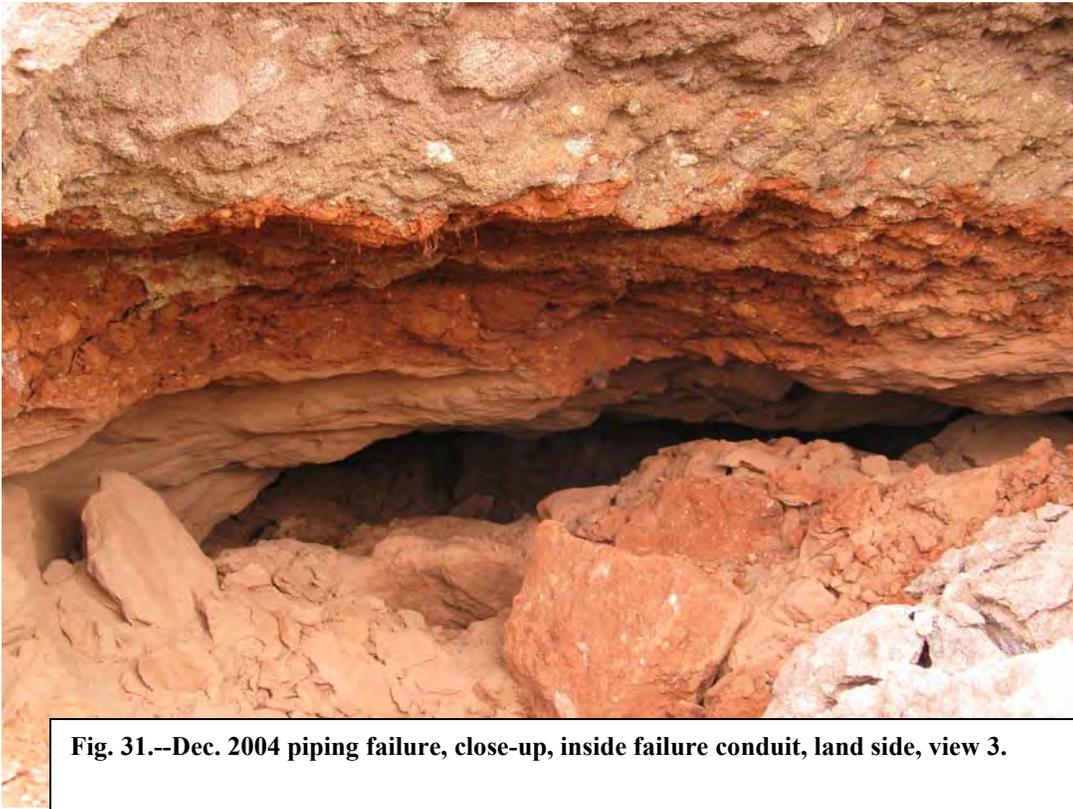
Dec. 2004 piping failure, close-up, inside failure conduit, land side, view 3.
